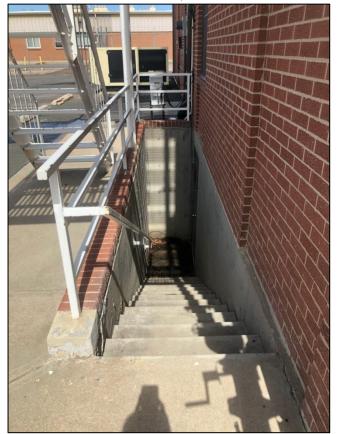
Western elevation, facing north. The entrance to the basement is hidden and protected by guard railing. Note the location near the staircase.
